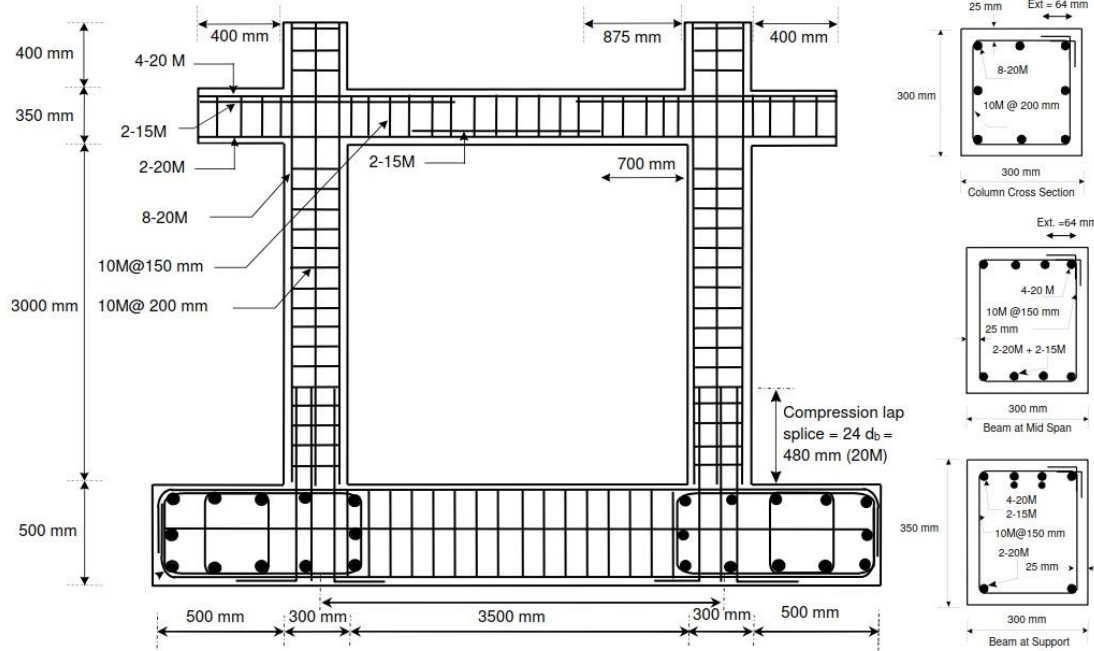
Section and reinforcement detail of the tested frame [17]
